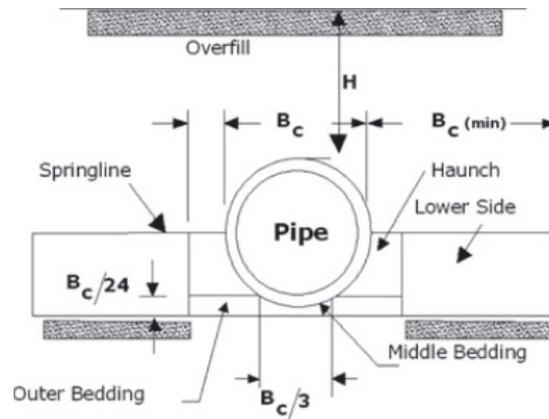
A Conventional standard trench section (ASTM D 2321)
